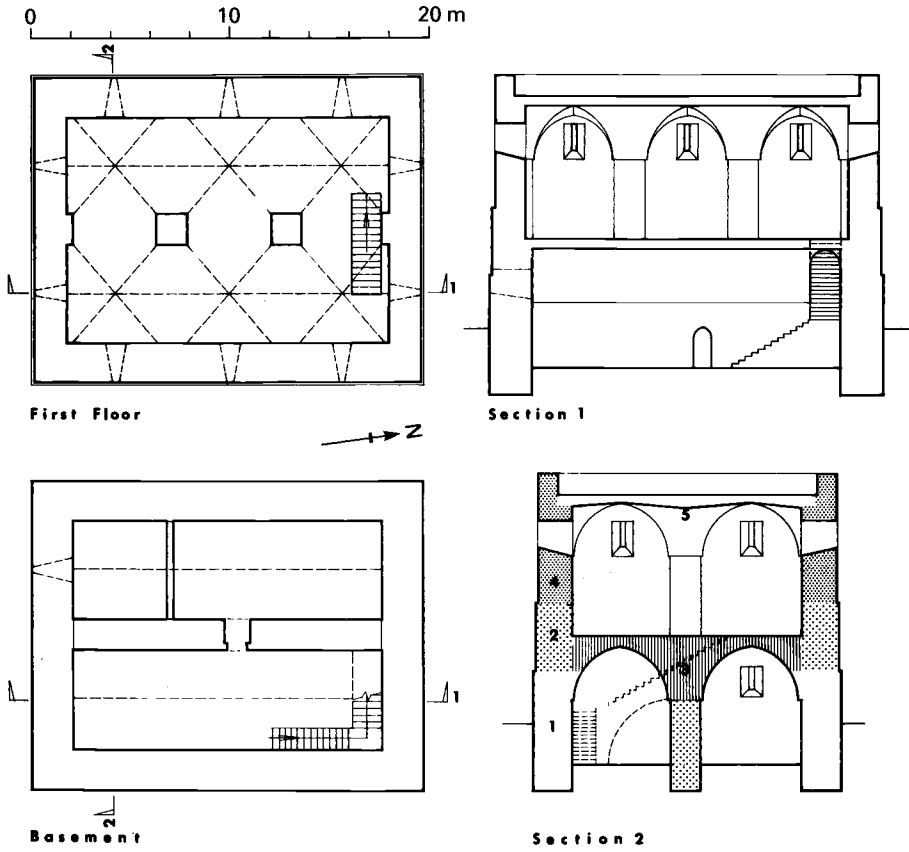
Red Tower: plan and section of a typical twelfth-century Crusader tower.
